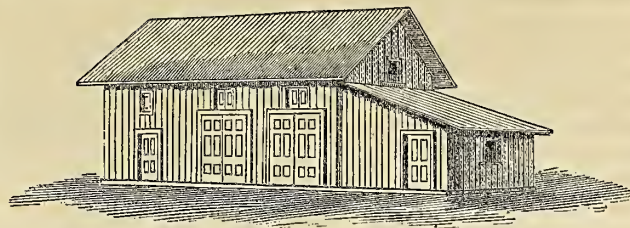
CARRIAGE HOUSE, STABLE AND WORKSHOP—ELEVATION.
